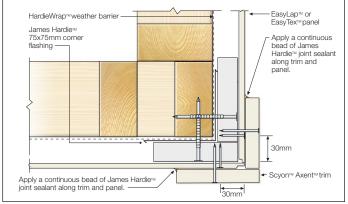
FACADE/SOFFIT JUNCTION EXTERNAL CORNER DETAILS
